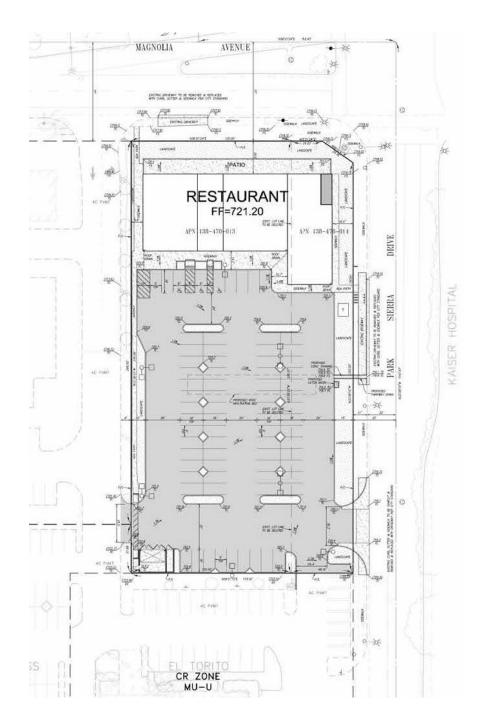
Project Plans (Conceptual Grading Plan)
